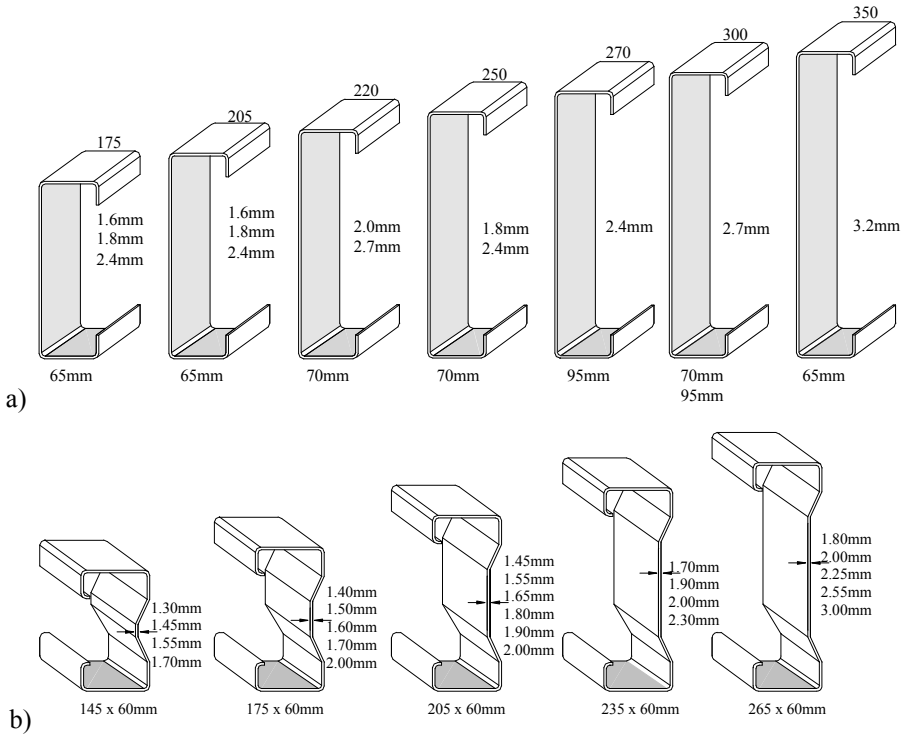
Multibeam sections: a) Lipped Channels; b) Σ sections
